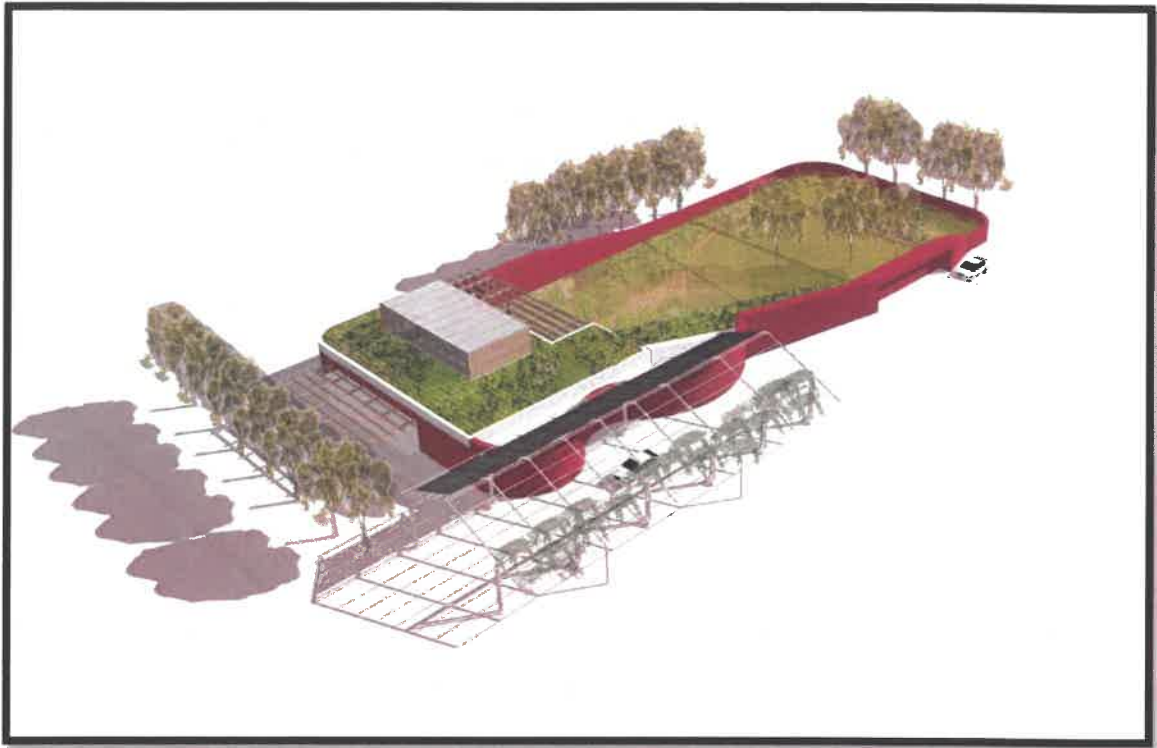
Conceptual image of the proposed restaurant (from Adam Tas Road)
